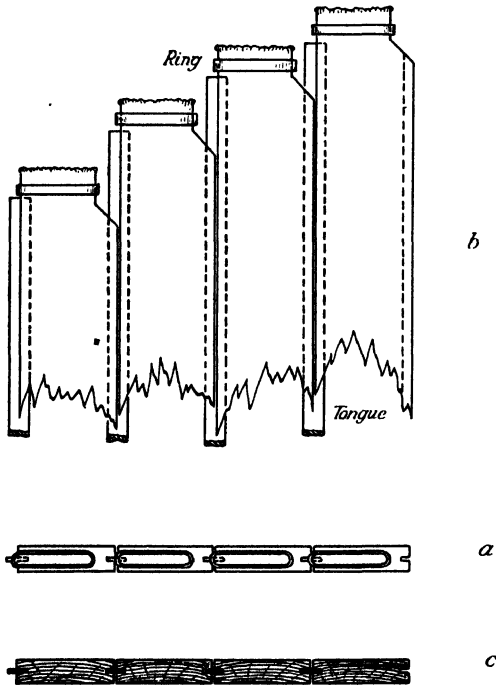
Iron Tongued and Grooved Sheet Piles. (a) Plan ;
